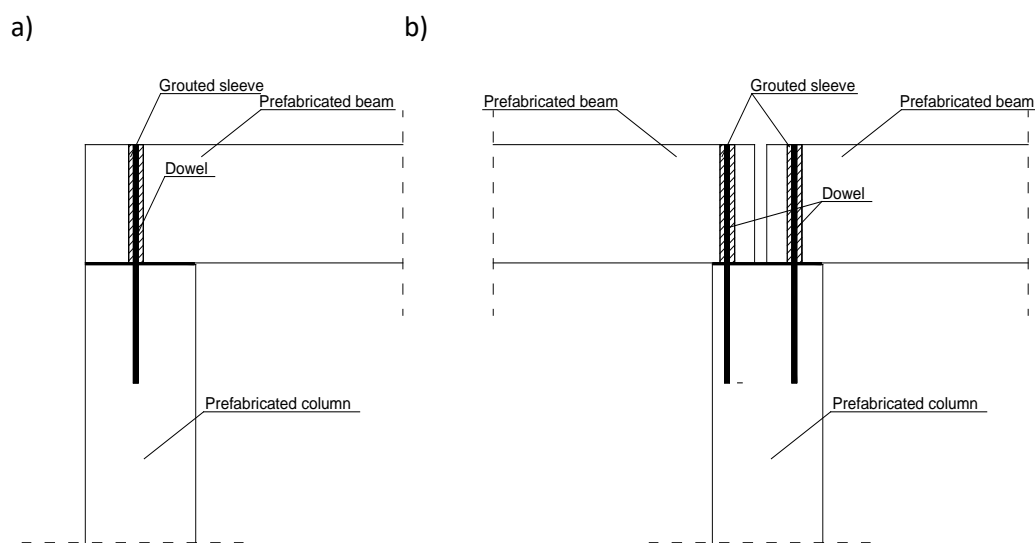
Example of beam-to-column dry connection, a) outer connection, b) inner connection
